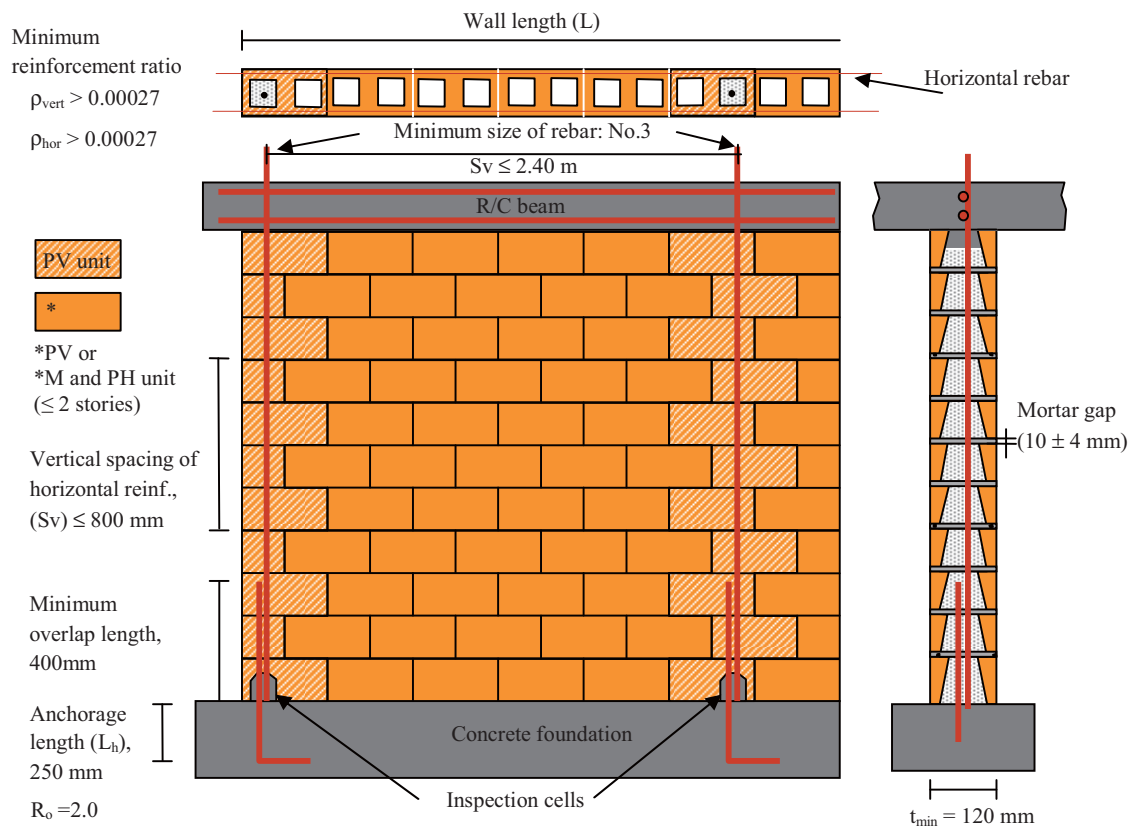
Schematic of a DMO partially reinforced masonry wall.
